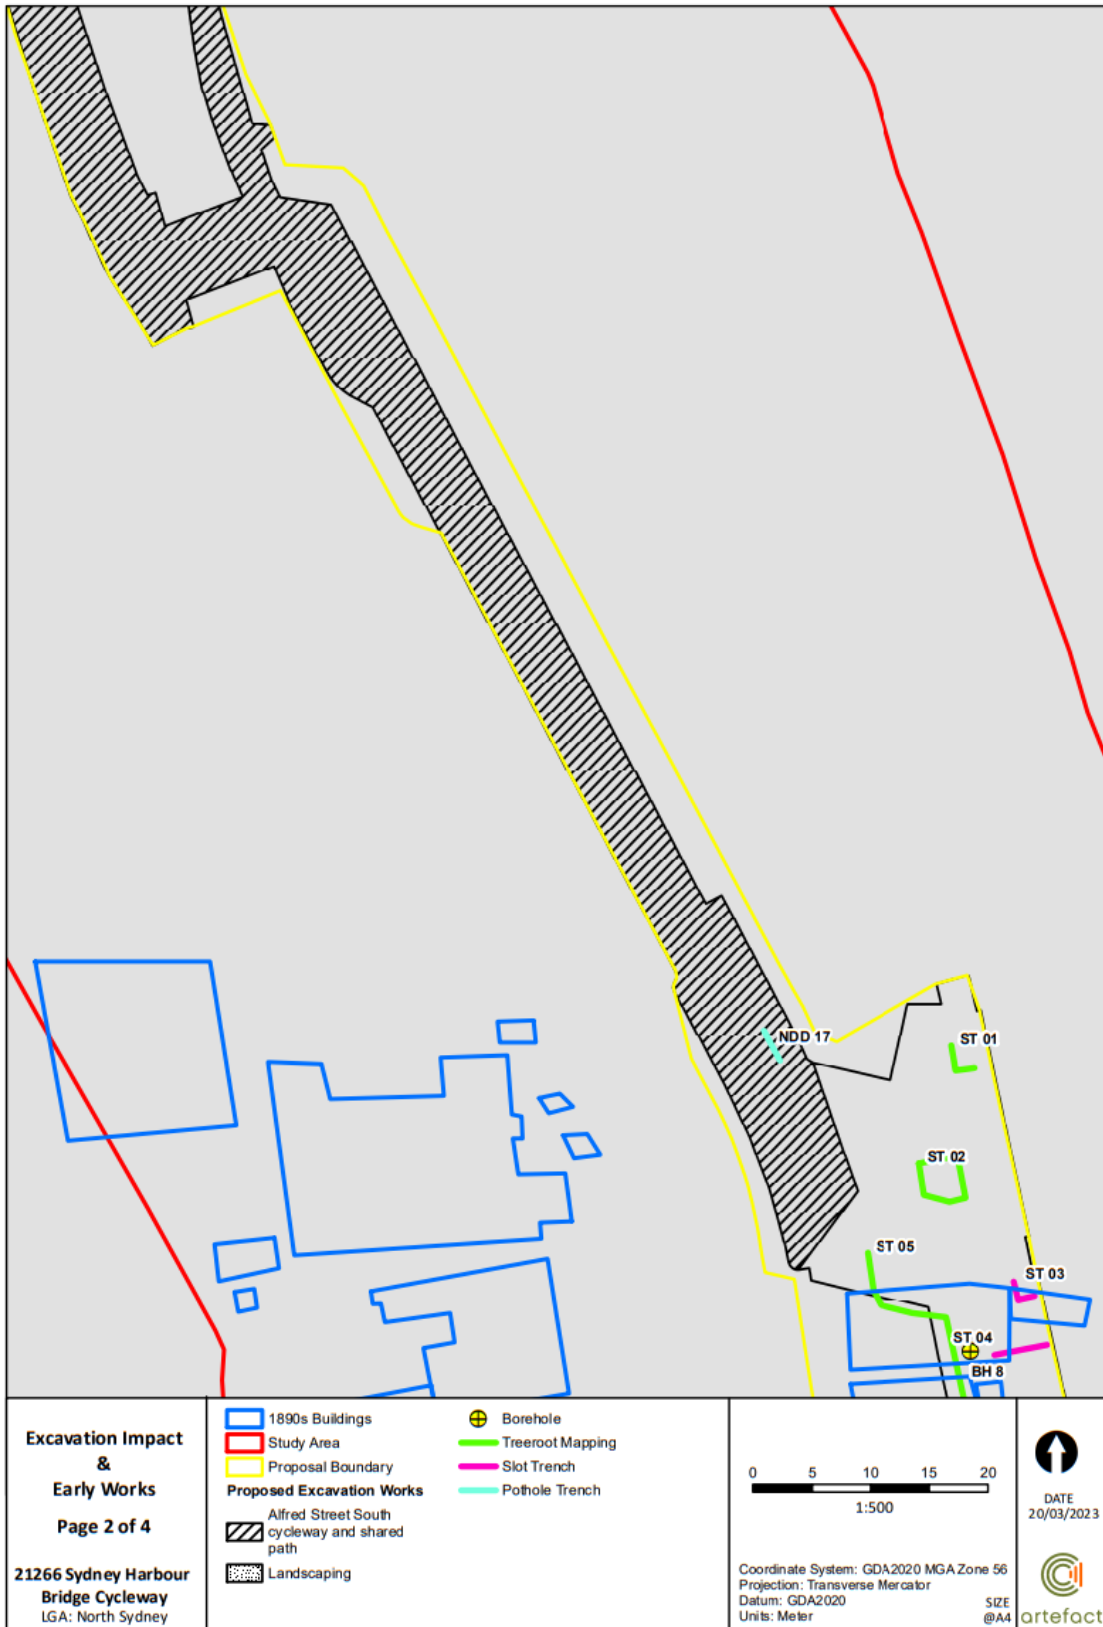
Proposed excavation impacts and intersection with potential Phase 2 archaeological remains (as detailed from 1891 Sydney Water Board plans)
